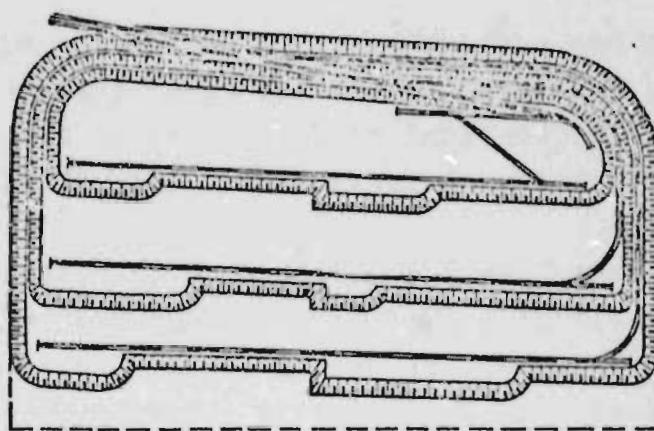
Layout of a pit with outgoing (ramp) roads running along the edges (from Shevyakov, p. 654).
